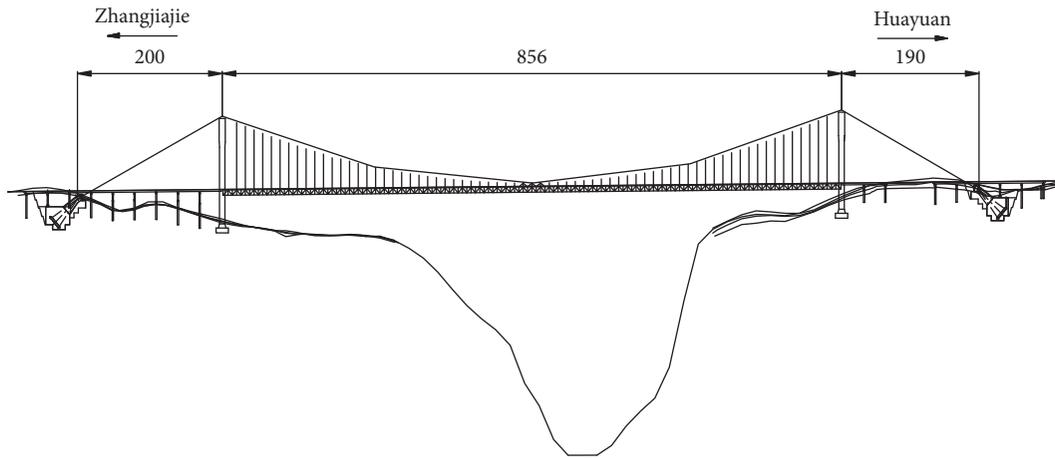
Bridge layout of Lishui Bridge on expressway from Zhangjiajie to Huayuan (unit: m).
